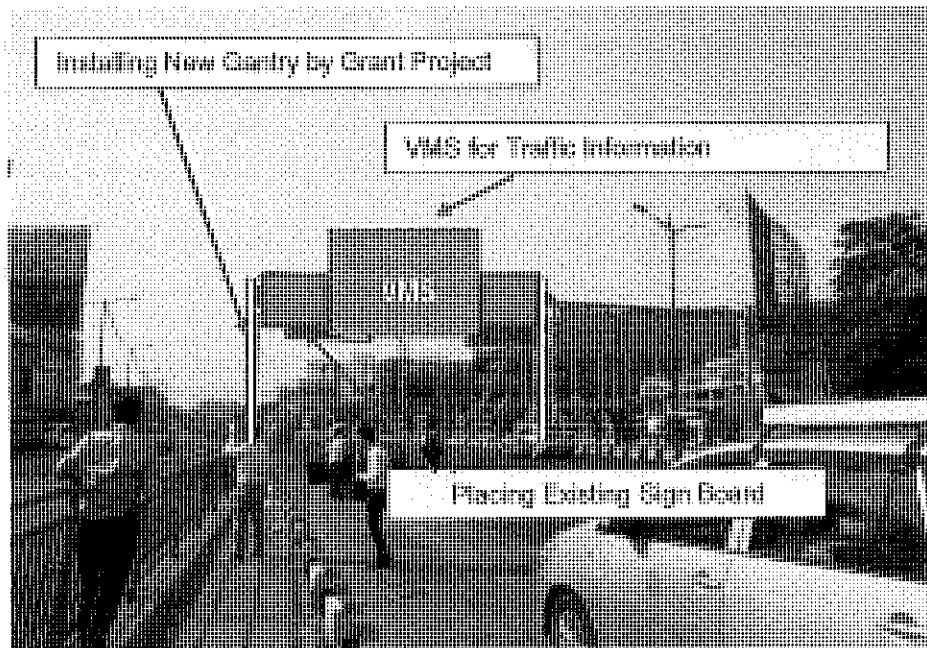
Proposed Installation and Arrangement at Silk Board Junction
